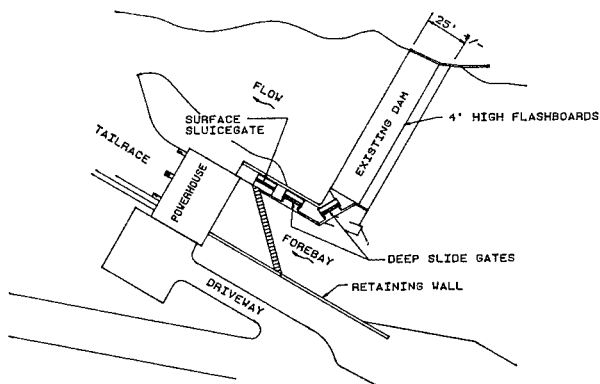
ST. REGIS FALLS SITE PLAN
